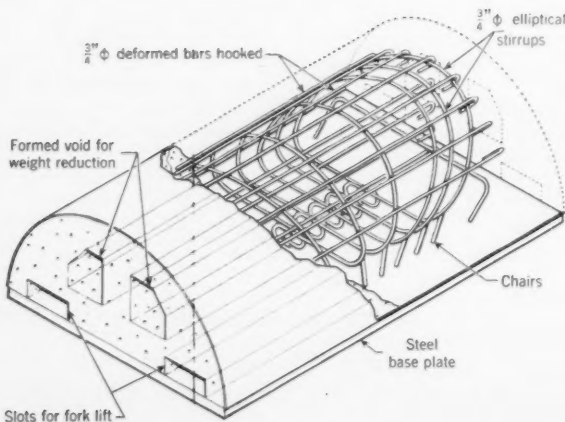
Concrete stretch form has reinforcement welded in place on steel base-plate.
